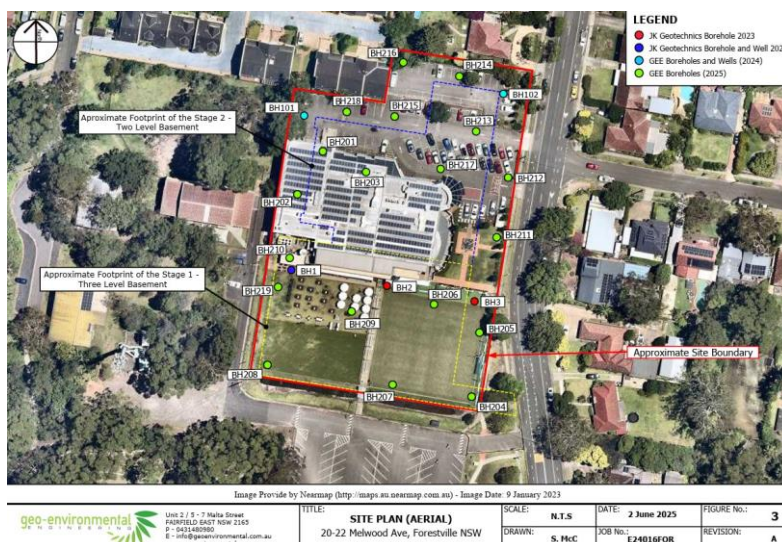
Bore Hole (i.e. testing) locations across the site (source: applicant's DSI)
